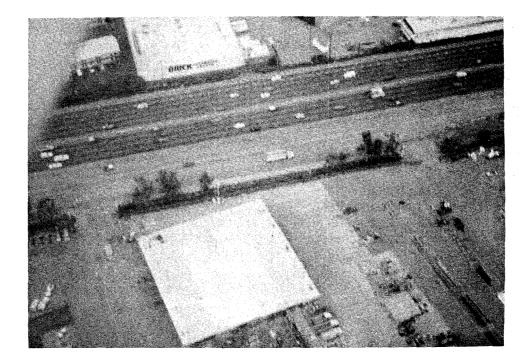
View of roof damage, facing north, from about 600 feet above ground level.
